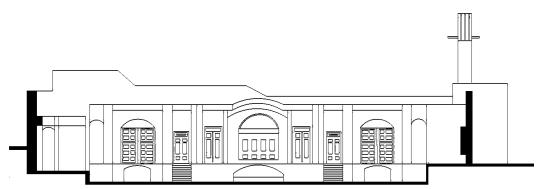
Section B-B of a traditional building in in Kashan (University, 2005)
